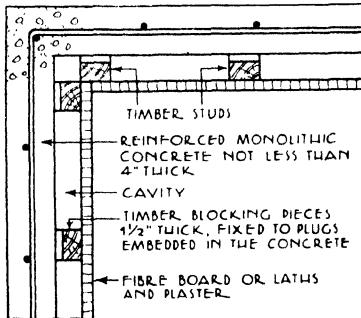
WALL WITH LINING OF FLARE BOARD OR LATH AND PLASTER ON TIMBER STUDS
